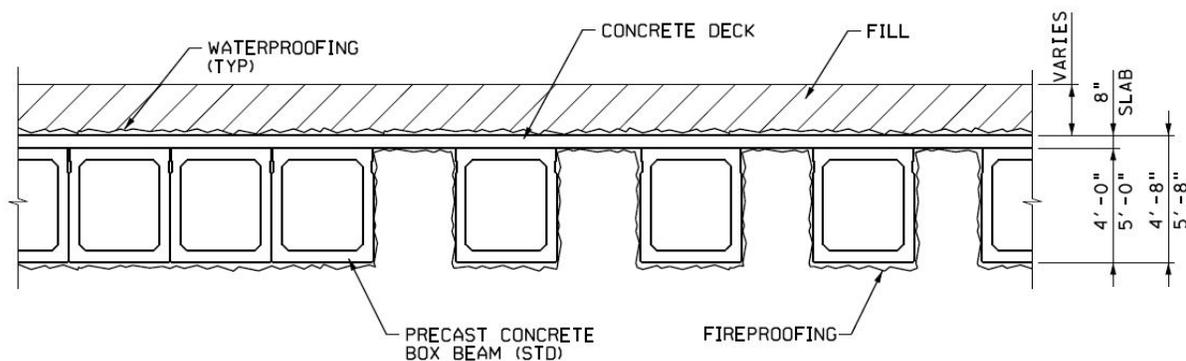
Superstructure Option S1, PC/PS Concrete Box Beams w/ Conc. Deck (Not To Scale)
